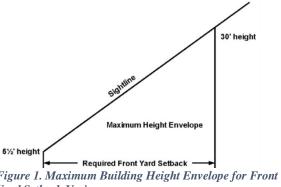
Maximum Building Height Envelope for Front Yard Setback Variance.
